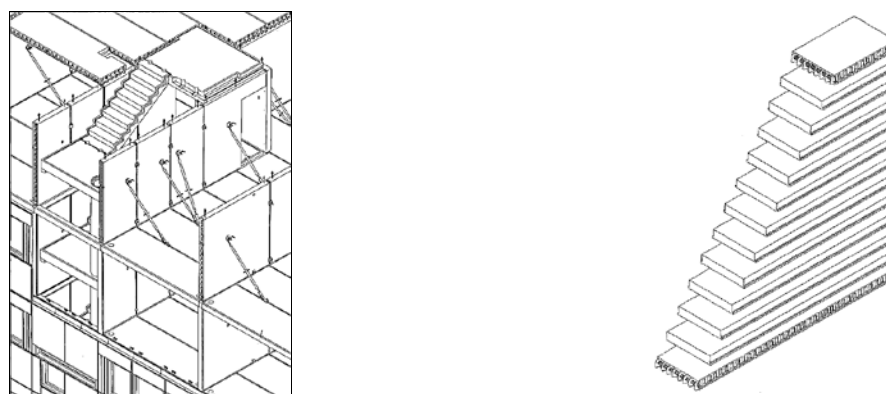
Main construction types for building type E3. Left: Concrete element housing construction. Ref. Nissen, 1975 [16]. Typical wall thickness 150 mm. Right: Examples of prefabricated concrete elements in standard lengths 1780-5380mm, thicknesses 180 -275 mm. Ref. Nissen, 1984, [17].
